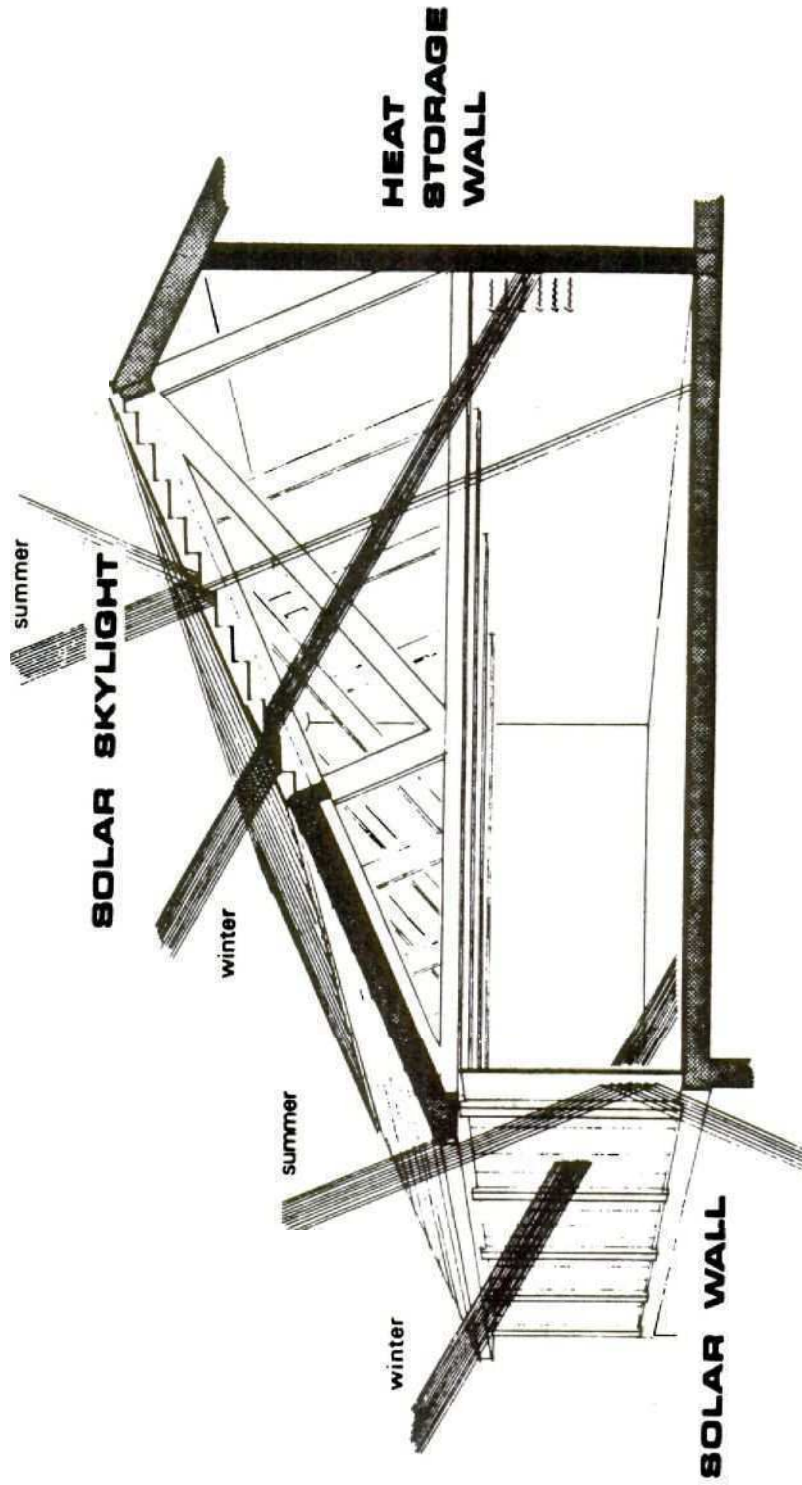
Solar Staircase scheme at the Cambridge School, Weston, Massachusetts (SAU).
